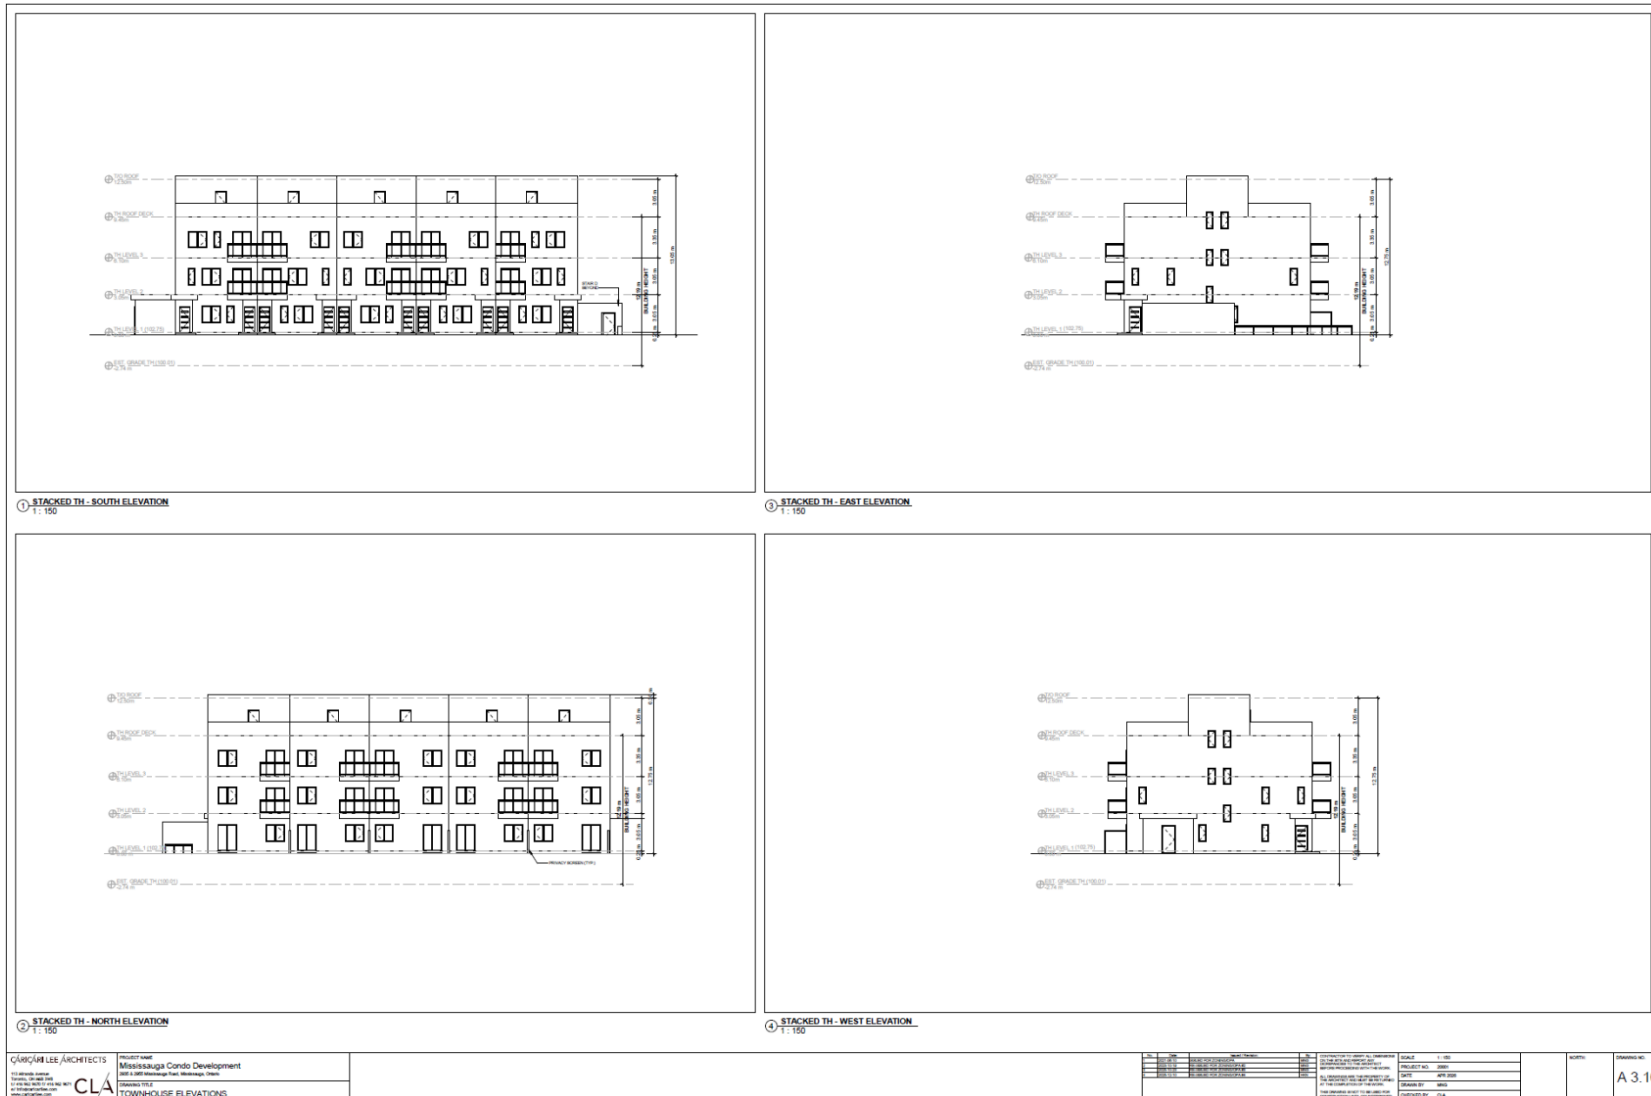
Elevations of the proposed townhouse block (Caricari Lee Architects, 2026)
